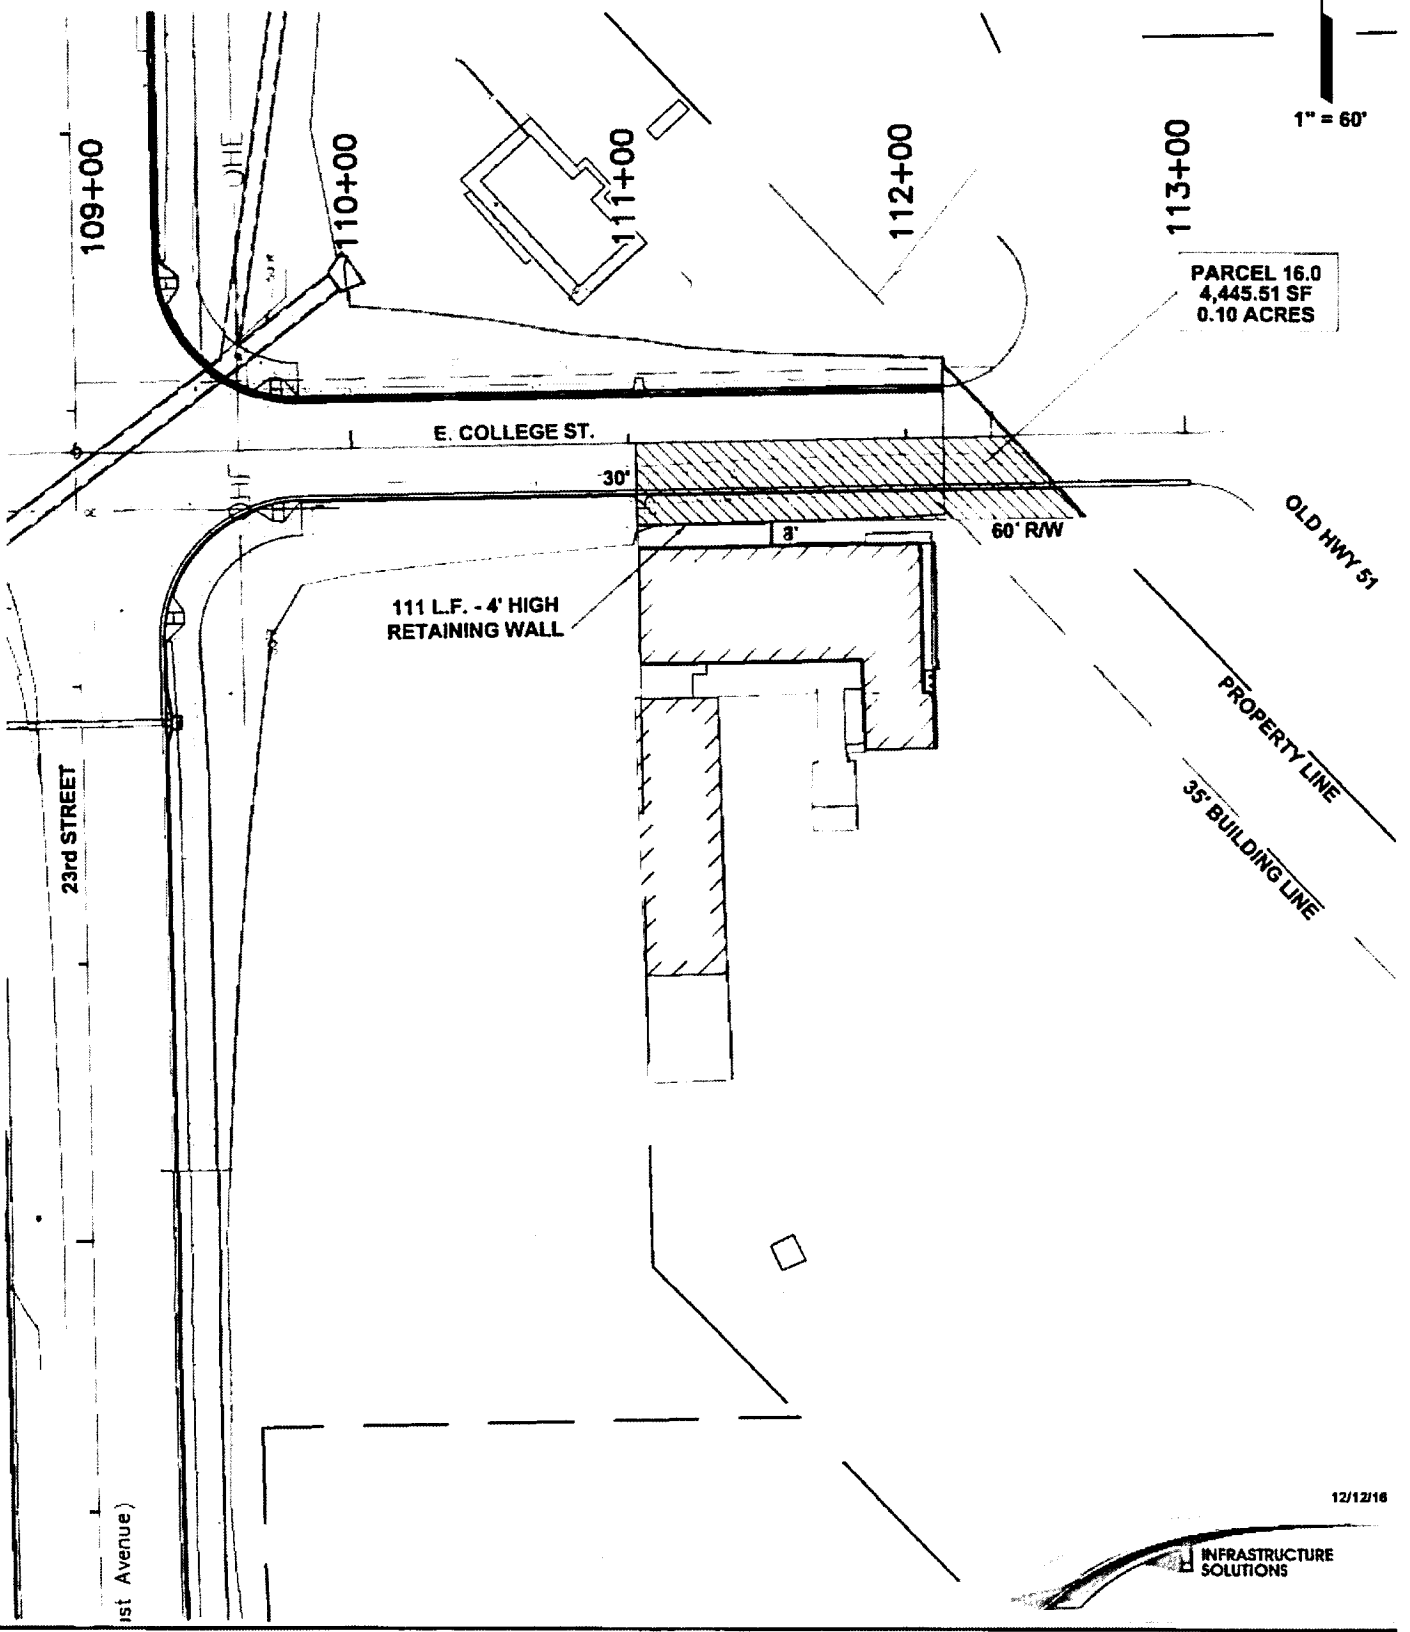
60' R/W WITH 4' HIGH RETAINING WALL PARCEL 16.0
